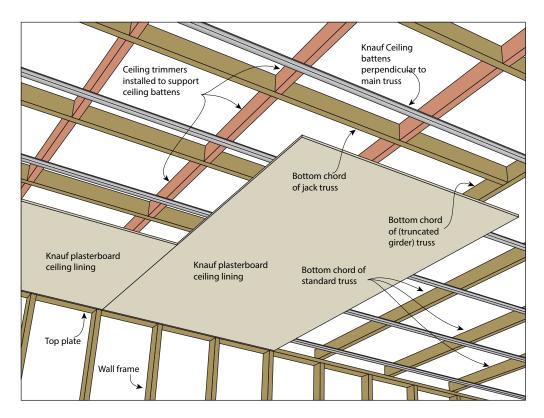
Install ceiling trimmers for Knauf ceiling batten systems. Install Knauf plasterboard perpendicular to Knauf ceiling battens
